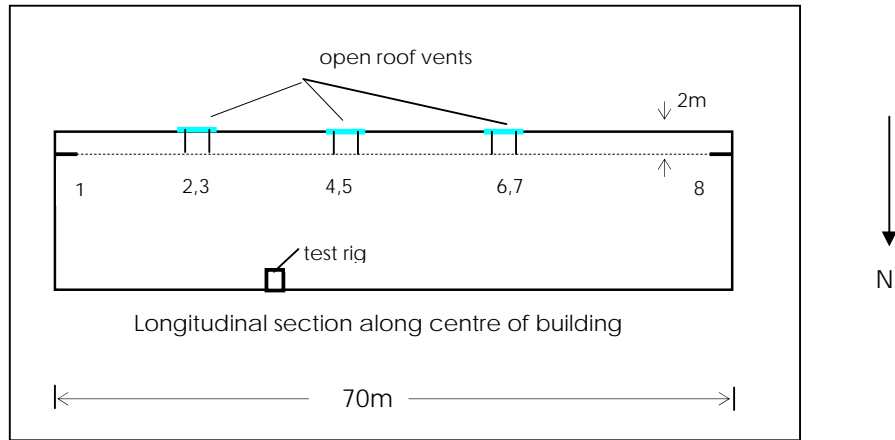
Filter Measuring Point locations near Roof of CESARE Building
